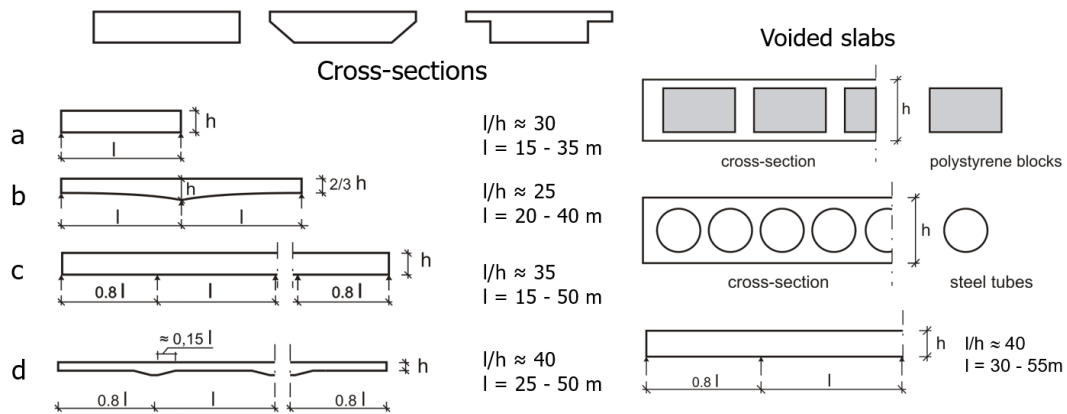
Different cross-sections and shapes of cast in-situ bridge decks [65]
